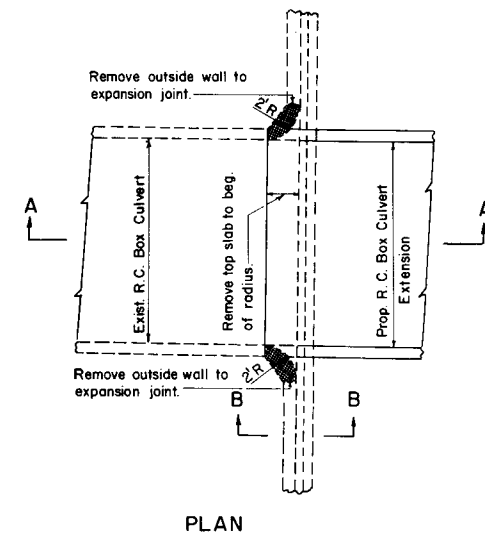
# DETAIL SHOWING OPENING IN TOP OF BOX CULVERT FOR DRAINING MEDIAN DITCH
